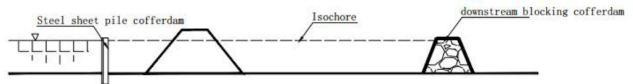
Longitudinal Section Diagram of Cofferdam for Embankment Construction (Drawn by the author based on the proposed downstream cofferdam method).
